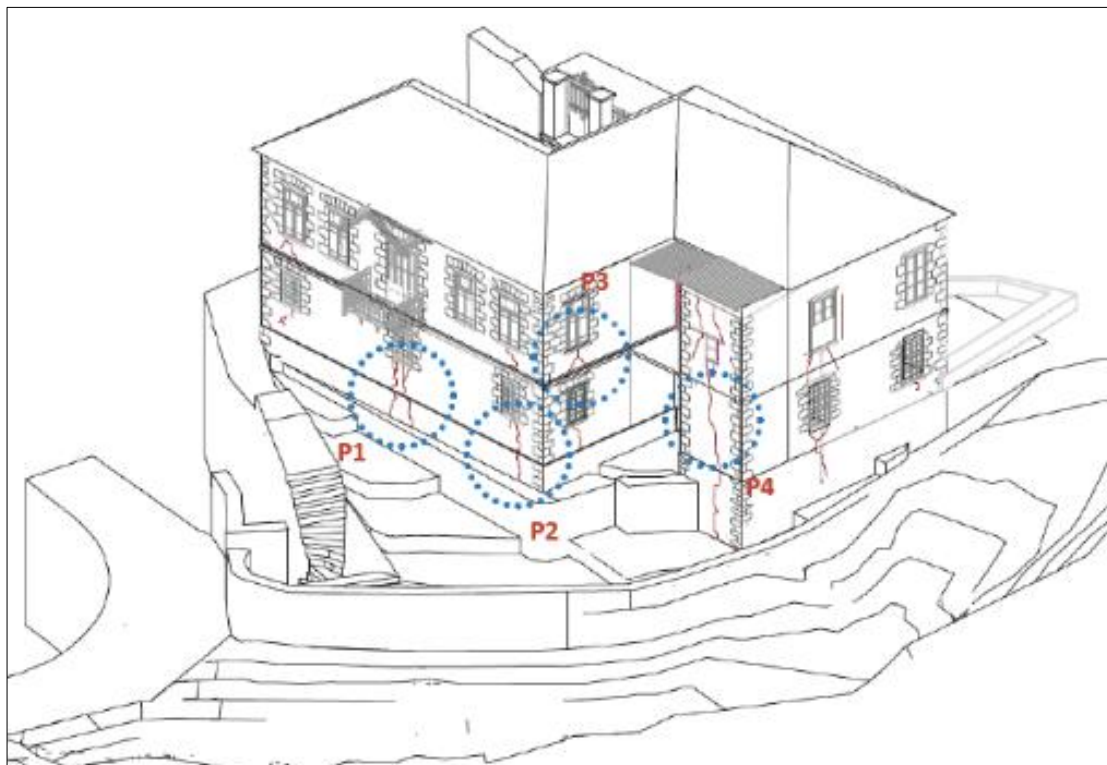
Earthquake cracks near the corner of buildings (Nikopoulou House, "Teacher's" House, Karageorgou House). Source: NTUA Research Team, 2023. Drawings: A. Vienna, A. Zacharaki, Z. Kondyli, N. Sakka, V. Laspia, O. Spyridaki, A. Stephani, D. Christou, postgraduate students of the MSc "Monument Protection" NTUA.
